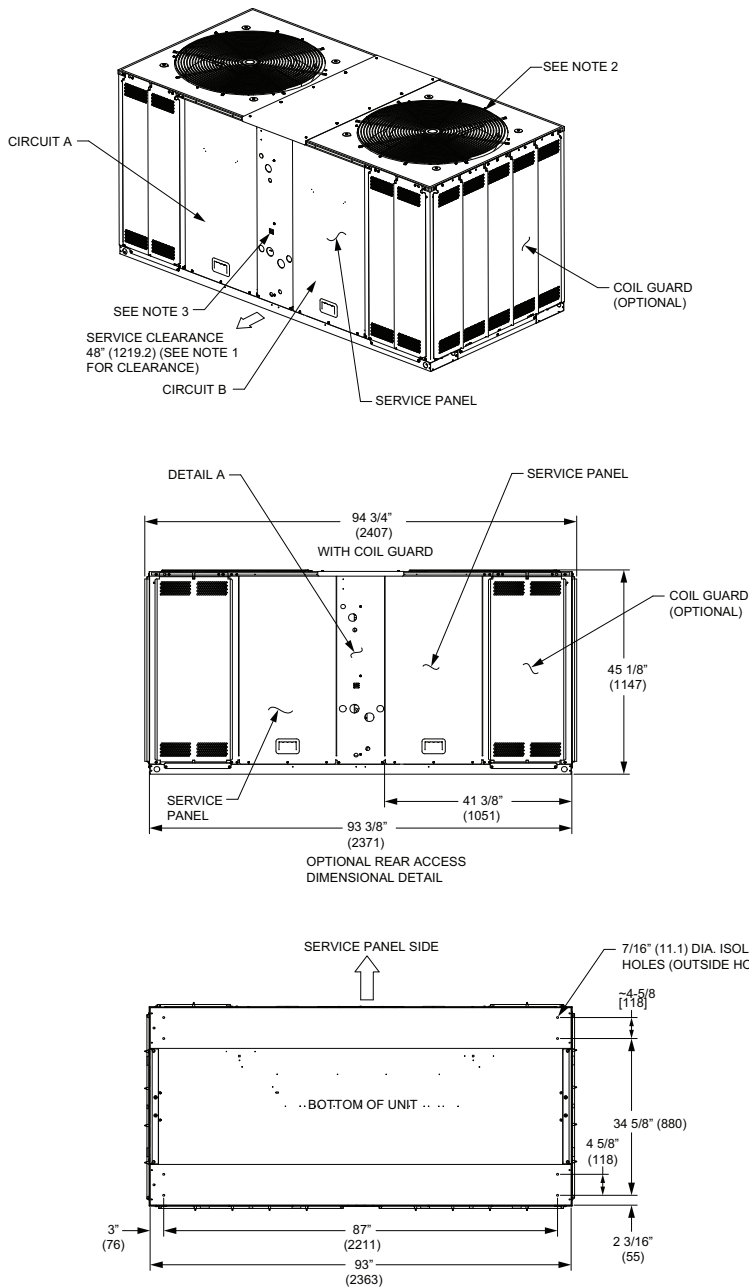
10 and 12.5 ton heat pump, dual compressor – in (mm)
